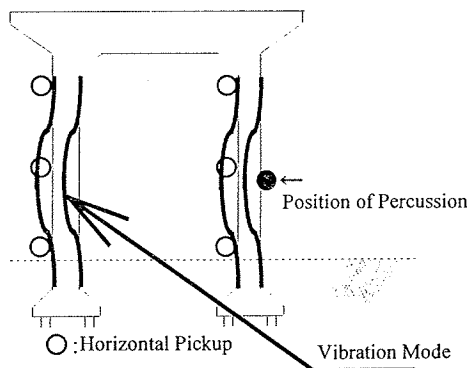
Diagram of the Dynamic Percussion Test Performed on the Midheight of a Bridge's Column (Second Vibration Mode of the column)
